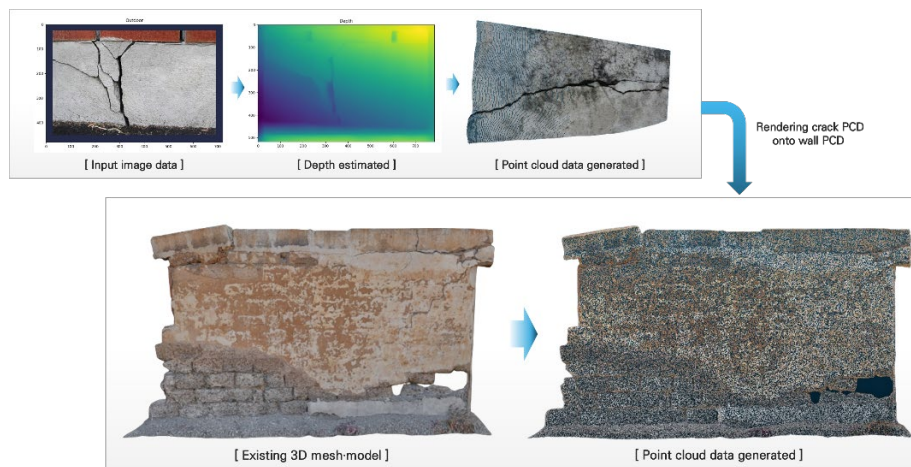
Workflow for concrete crack and wall PCD synthesis
